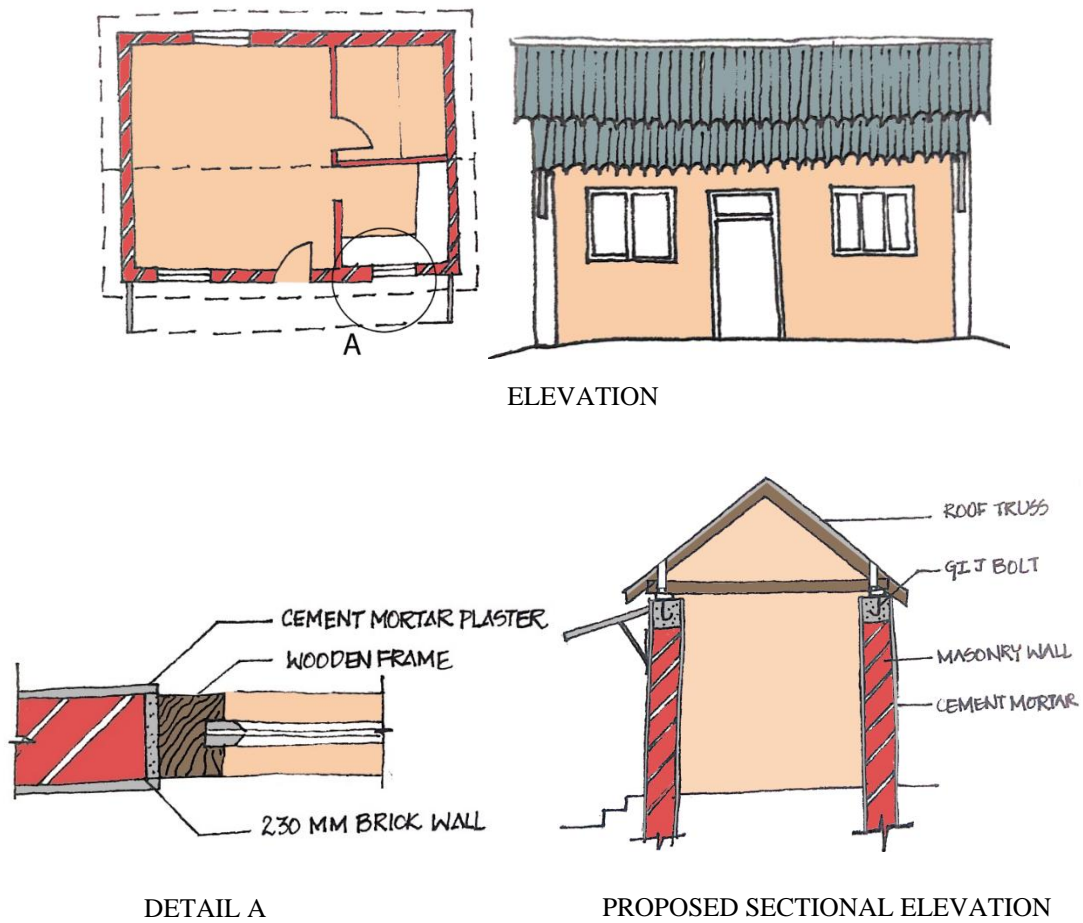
BRICK MASONRY WALL WITH AC/GI SHEET
